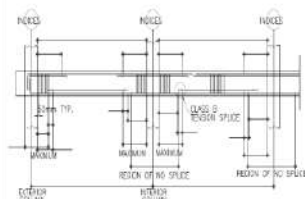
TYPICAL NAH DETAILS FOR PRISMATIC GIRDERS
